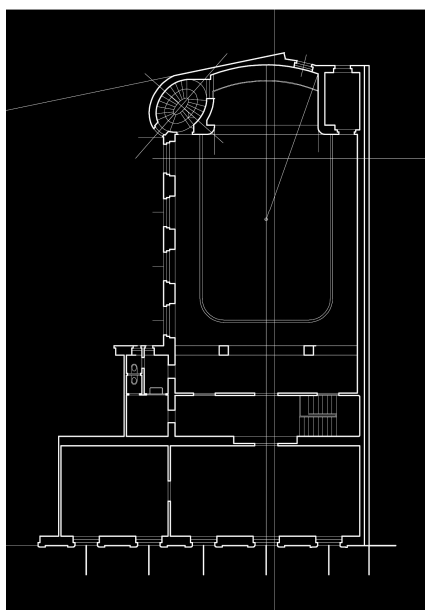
Plan of the ground floor of the Trgovski Dom (drawing by Max Fabiani).
